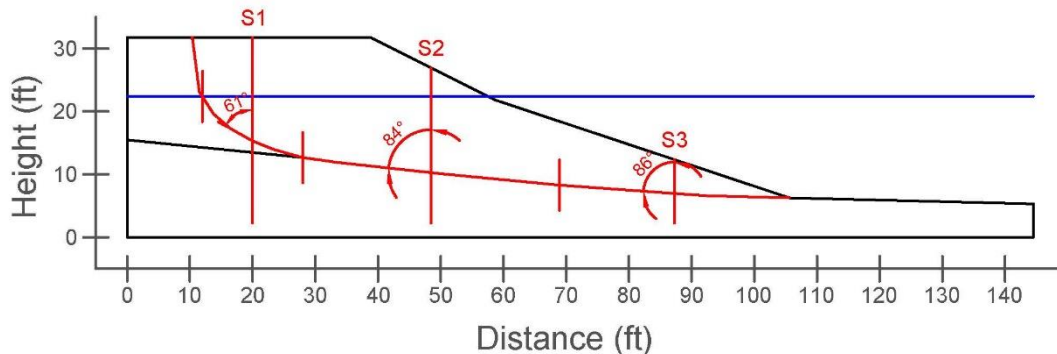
Sub-sectioning of the cross-section and failure plane for Lake Ackerman Highway Embankment
